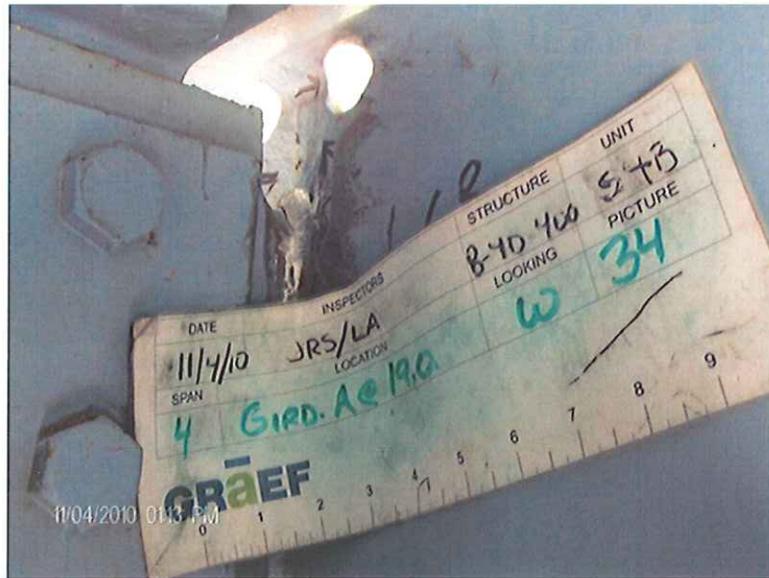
Fatigue crack at top of girder connection plate after completed NDT.
